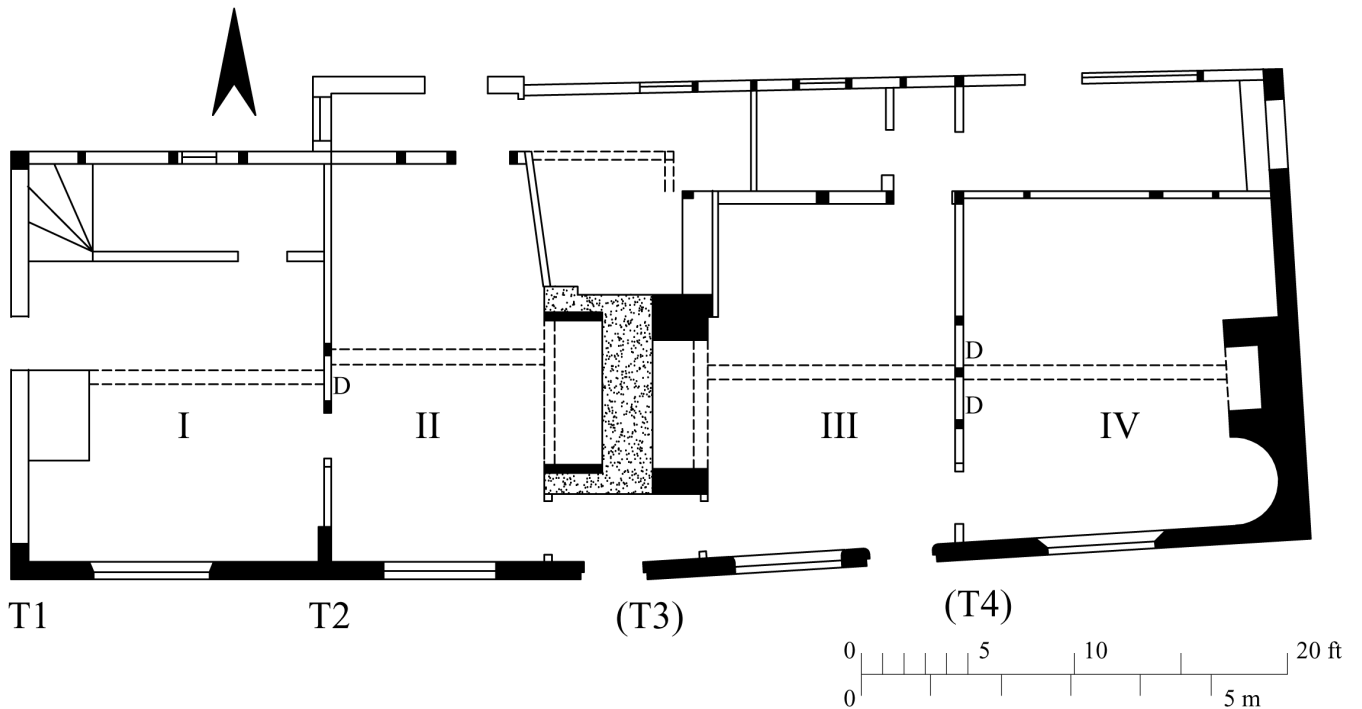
Plan, showing truss and bay numbering. Note: The angles of the two front walls and the other plan elements have not been precisely surveyed.
